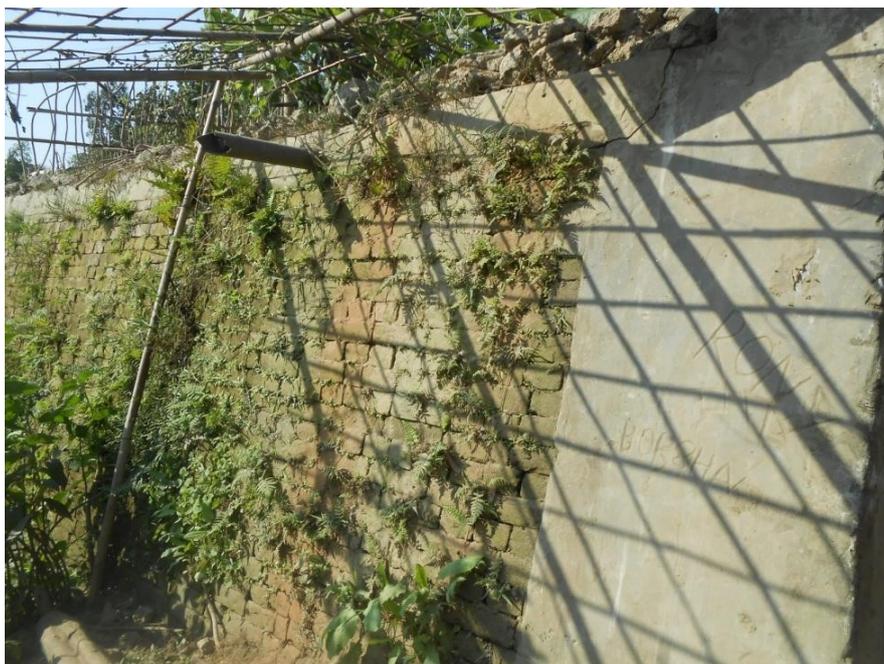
Wanted plants have grown in the protection wall (Field survey, 2015)
